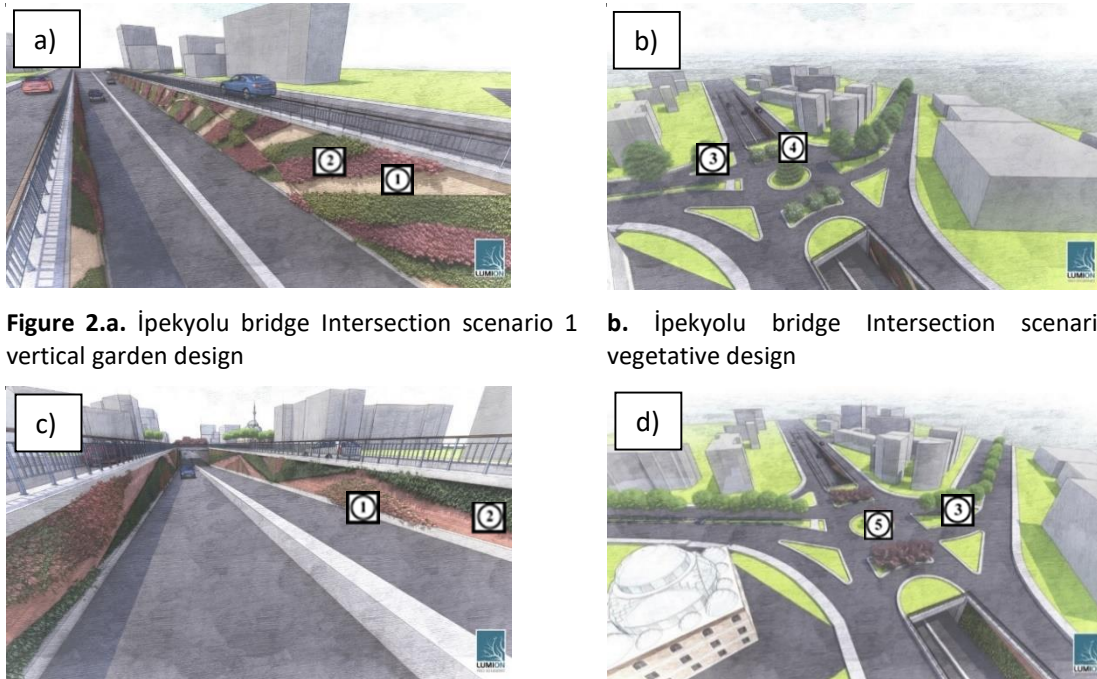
a. İpekyolu bridge Intersection scenario 1 vertical garden design
